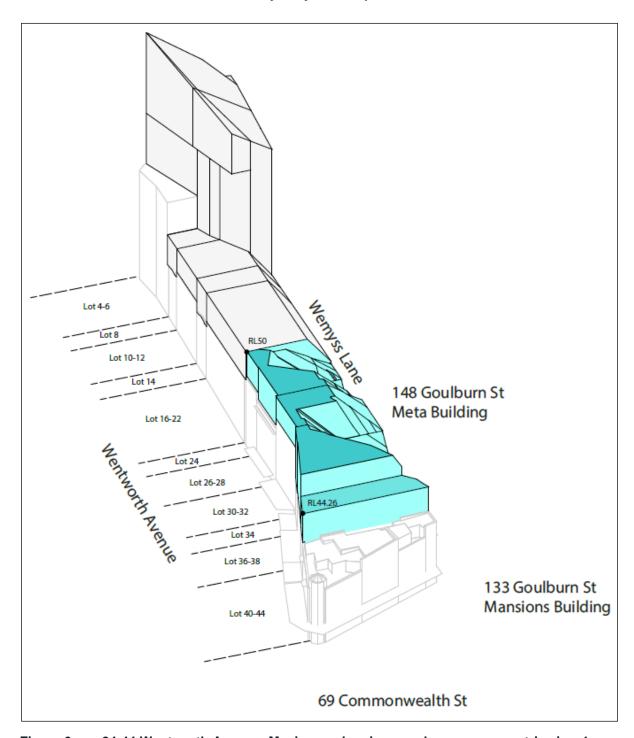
xx: 24-44 Wentworth Avenue: Maximum planning envelope – axonometric view 1
